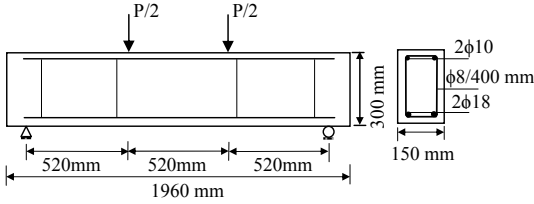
Geometry, arrangement of reinforcement and load of the tested beams.
